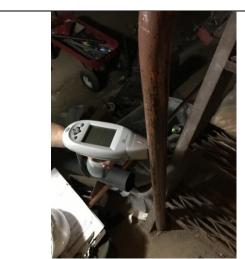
Black Pipe – Tunnel <1mg/cm² lead
